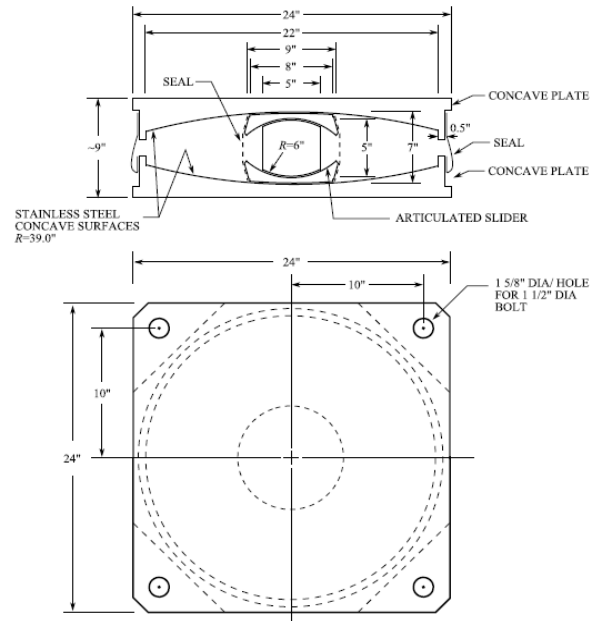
Section and plan views of the smallest size triple FP bearing without inner restrainer
